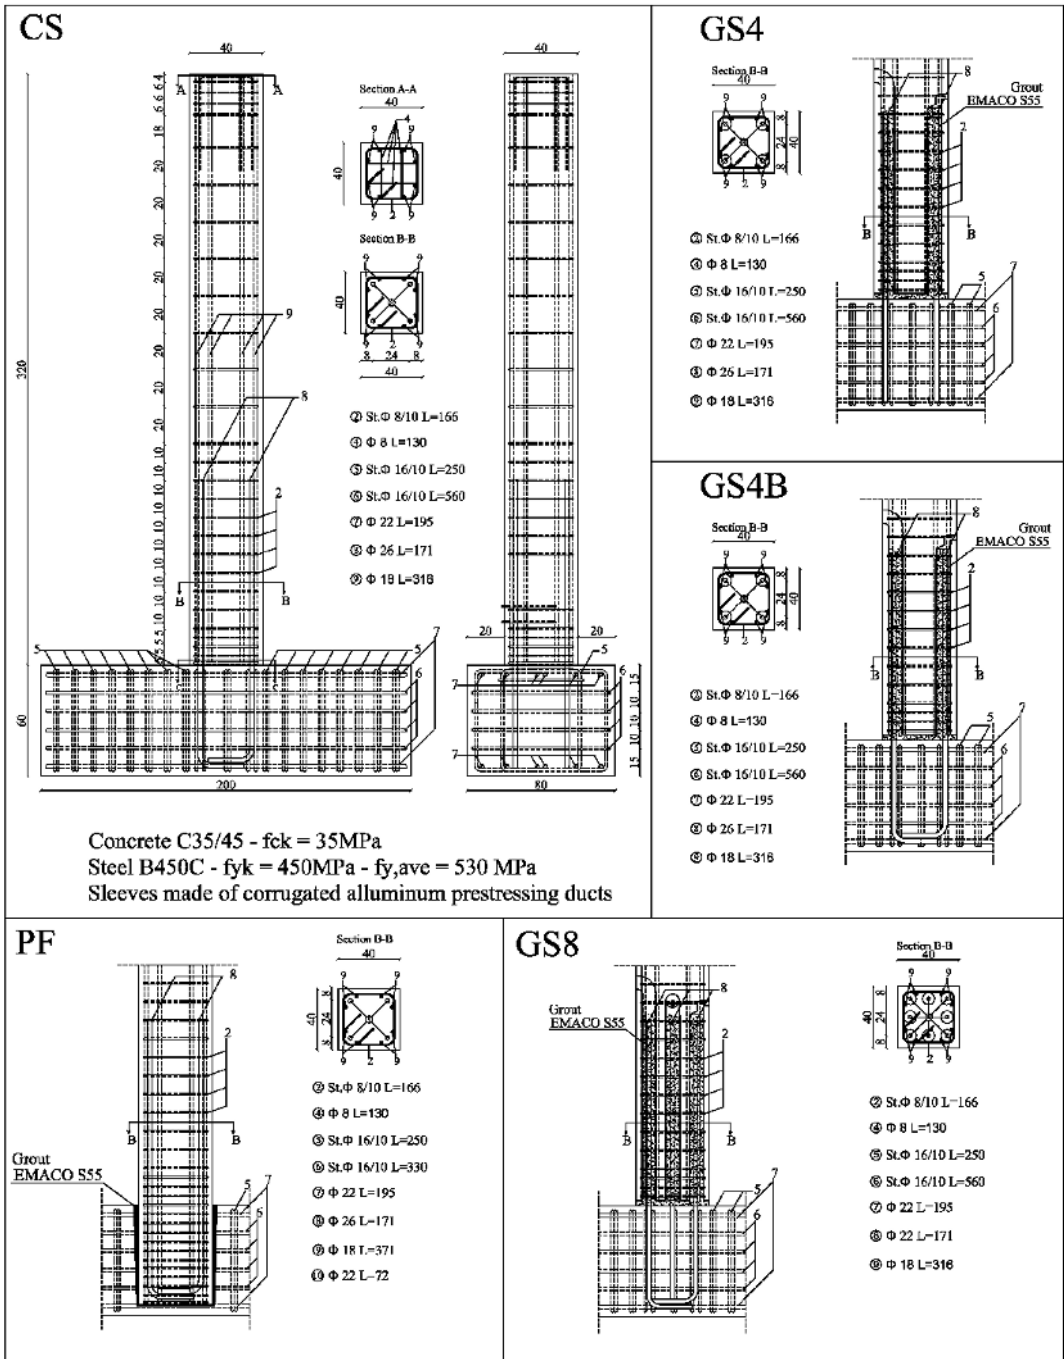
Tested specimens (Dimensions expressed in cm): (a) CS, cast in situ column; (b) GS4, column with four grouted sleeves; (c) GS4B, column with four grouted sleeves and 90° hooks in the anchored bars; (d) PF, pocket foundation; (e) GS8, column with eight grouted sleeves.
